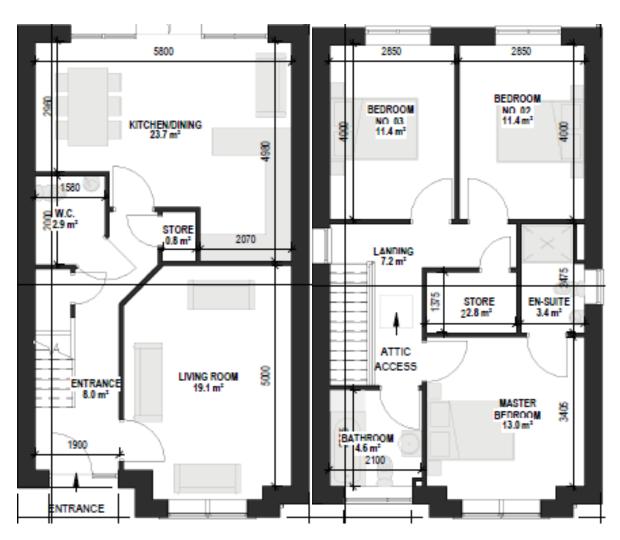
Ground floor plan of House Type 2.4 (left) and first floor plan House Types 2.4 (r).
